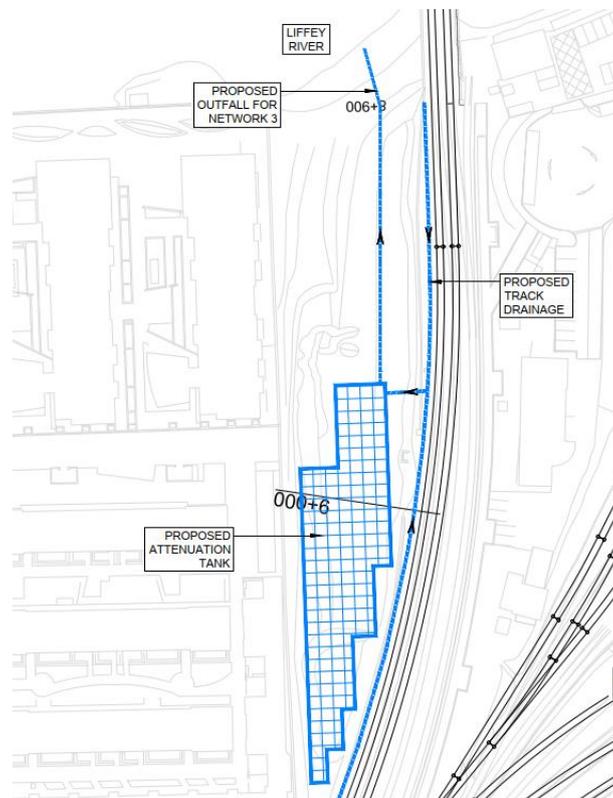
Proposed Track Drainage Layout at Heuston West
